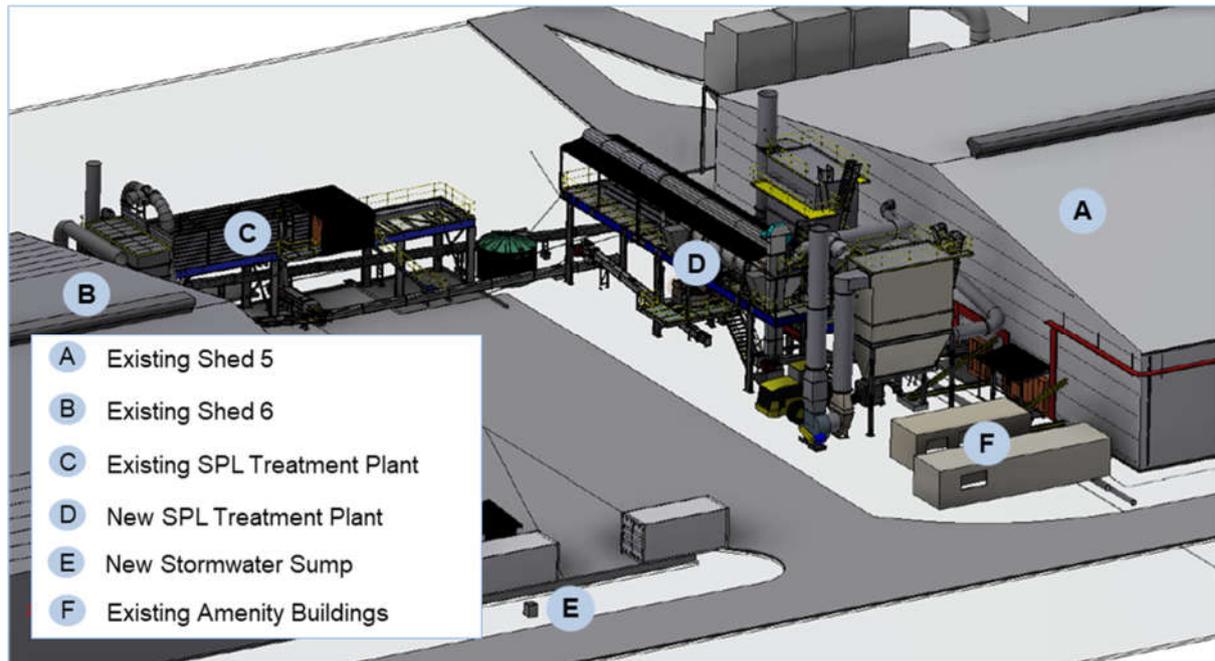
Existing SPL Plant and New SPL Treatment Plant
